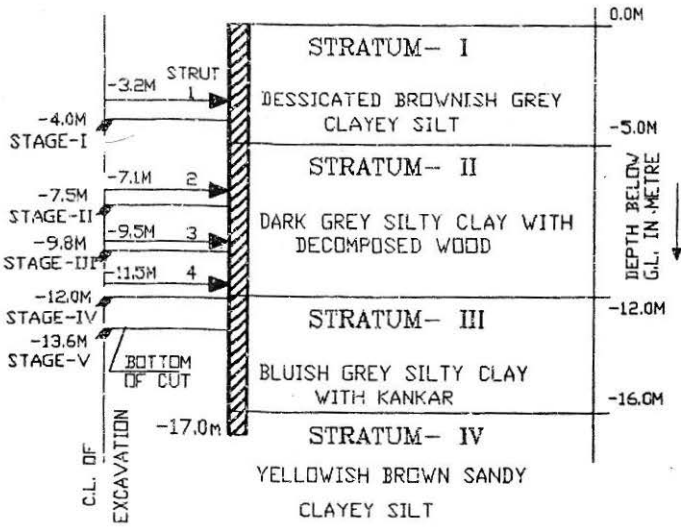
Soil Strata and Excavation Profile for Test Section 2
